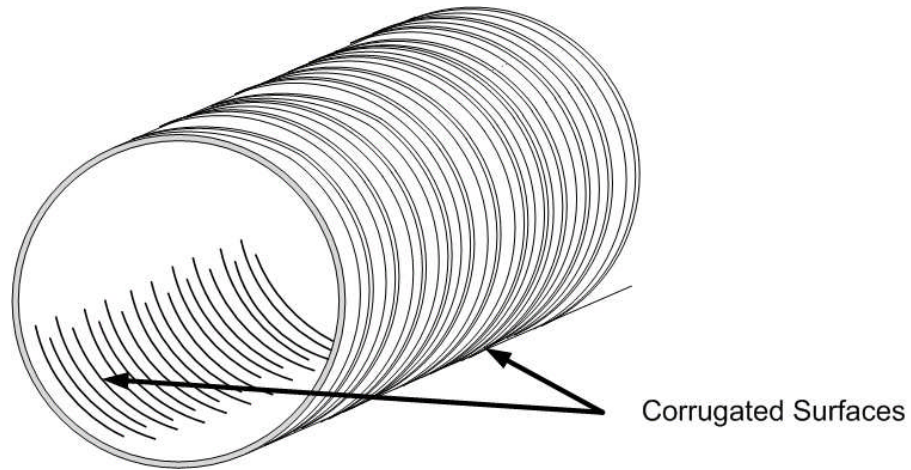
Schematic of a Single Walled Plastic Culvert
